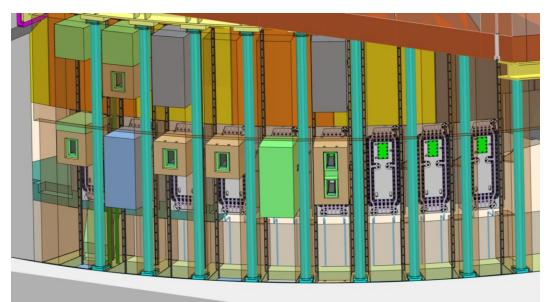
The orange shielding (translucent here) can house shutter(s); the shielding is 'wrapped around' the bunker roof support beams (green-blue). Shutter(s) can be stored in the floor as well.
